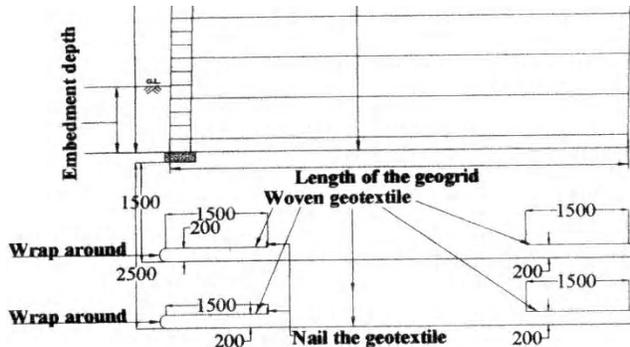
Typical RE Wall NH-8 Kamrej Soil Adopting Soil Improvement Depth 2.5 m, Geofabrics as Reinforcement.
